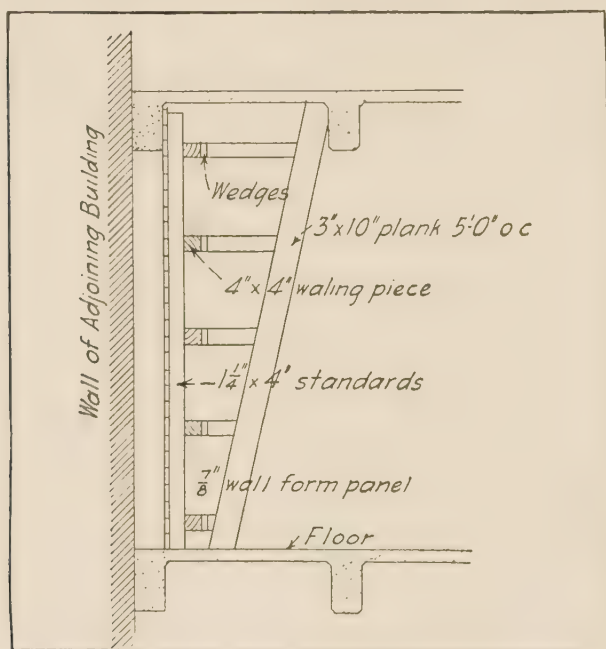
Method of bracing wall where through-bolt cannot be used.
